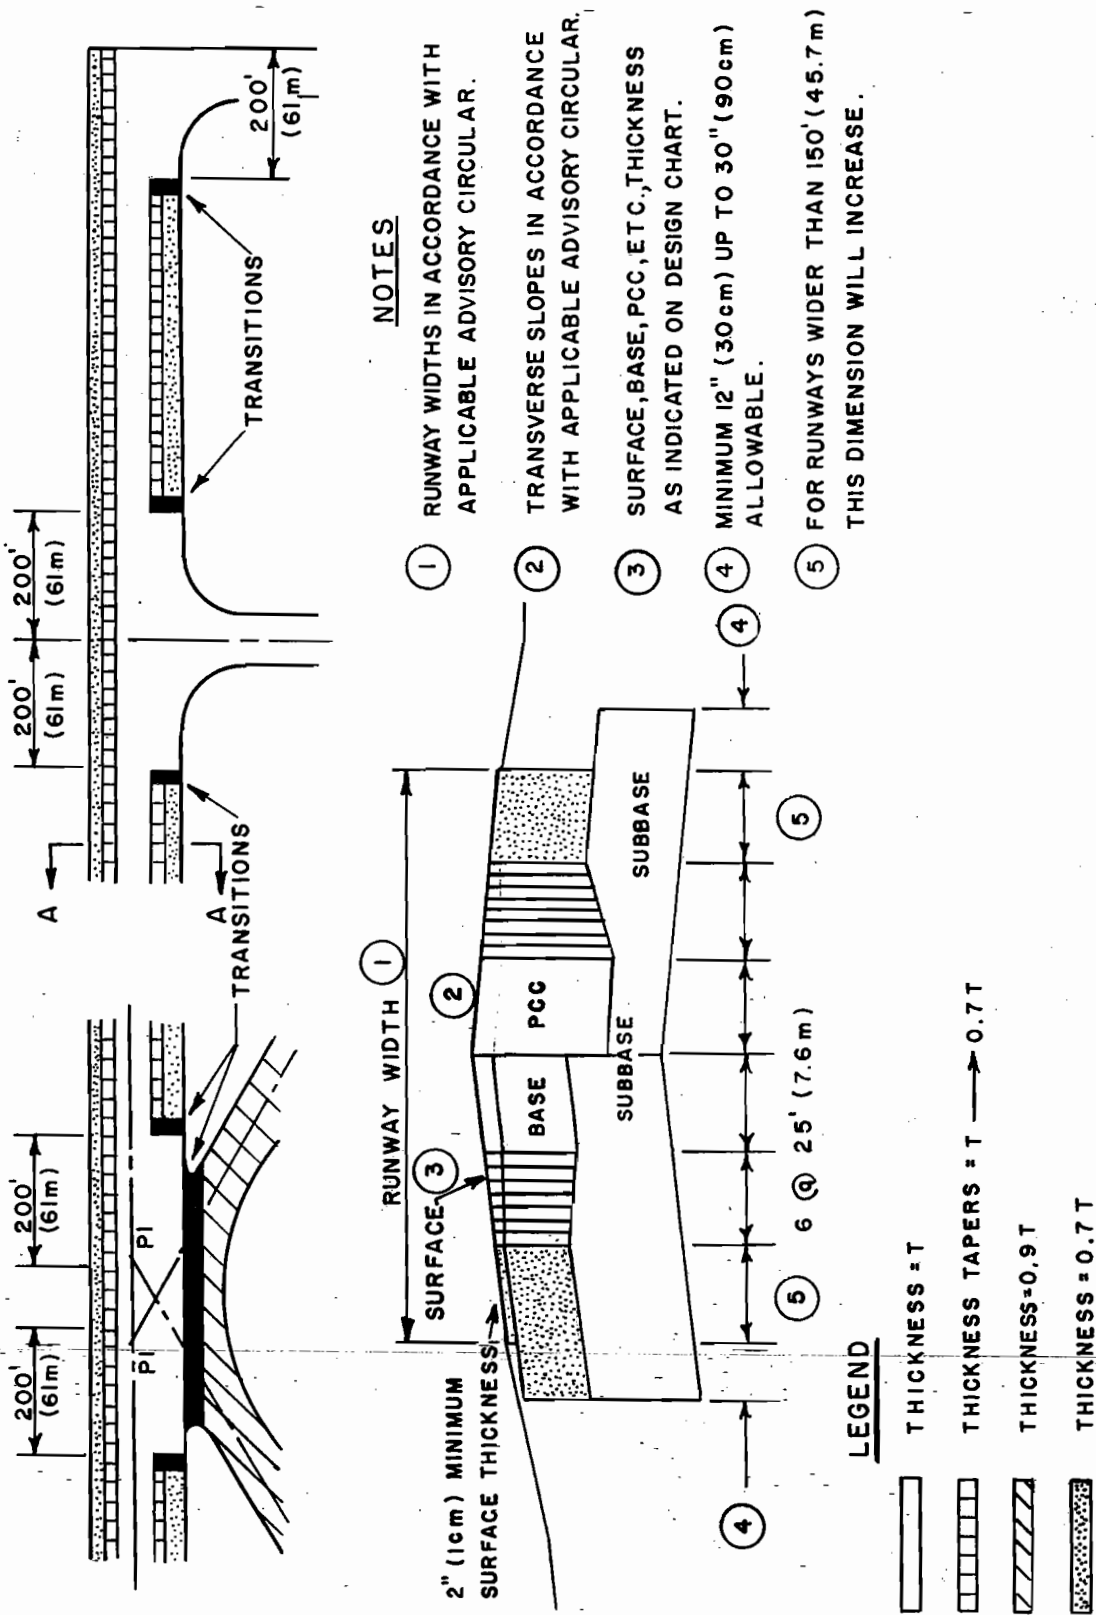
TYPICAL PLAN AND CROSS SECTION FOR RUNWAY PAVEMENTS
